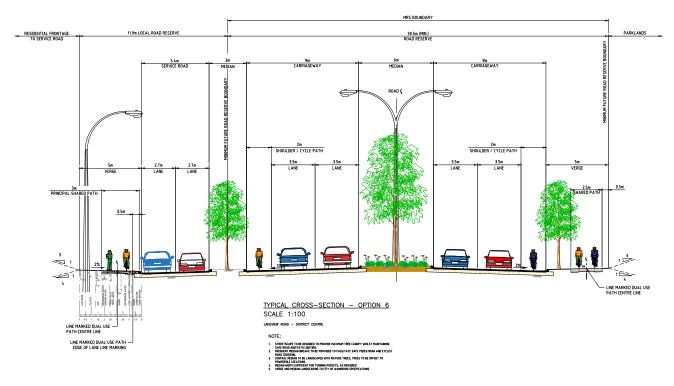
Cross-section Lakeview Road (Neighbourhood centre)
